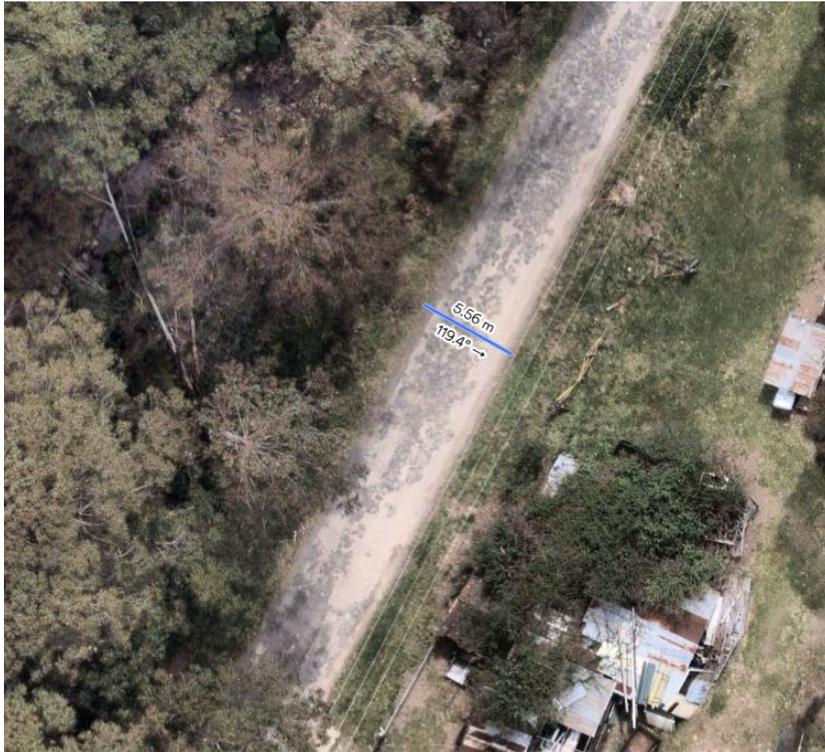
Carriageway width of State Mine Gully Road, measured at a random location between Atkinson Street and the development site
